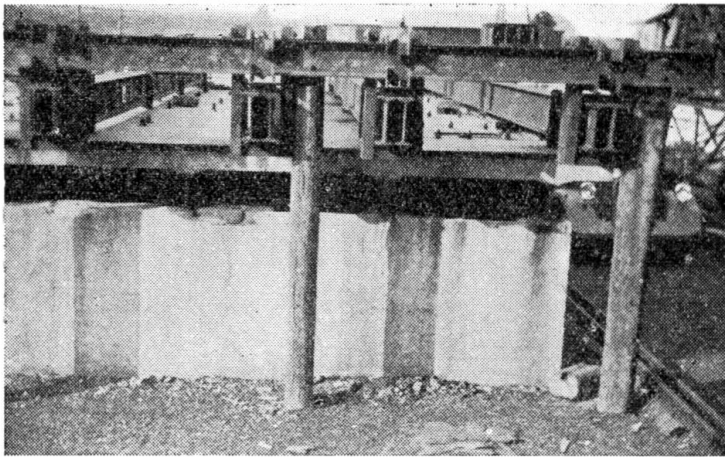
View of the test-installation with supporting reinforced concrete piers and cantilever loading arms
